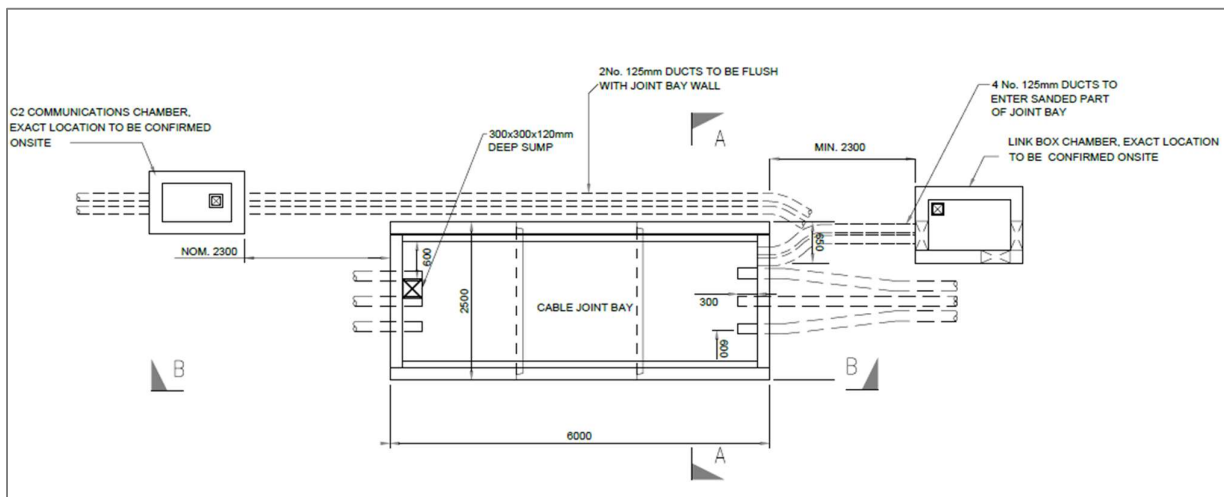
Typical Joint Bay and Link Box Plan Layout
